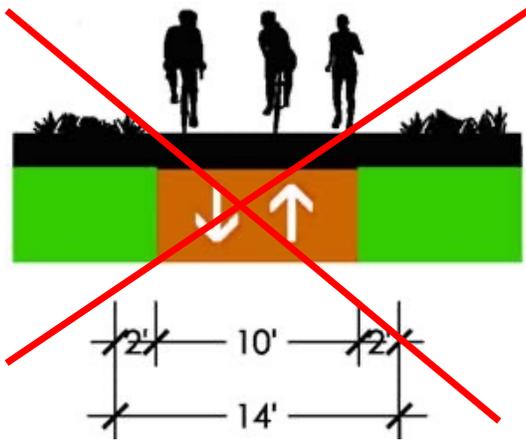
A.6.b. Central Bike Path [NOT RELEVANT TO NEW PLAN]
